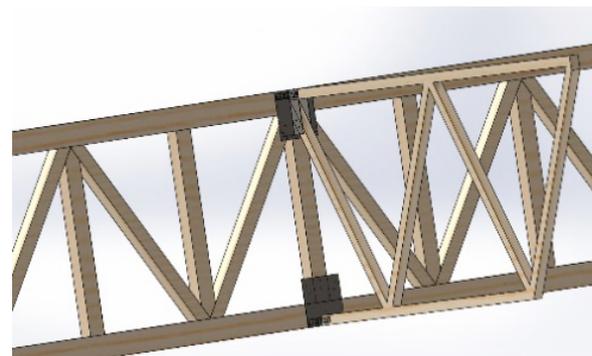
Sheet steel plates and brackets to join minor lateral trusses to major longitudinal truss.
